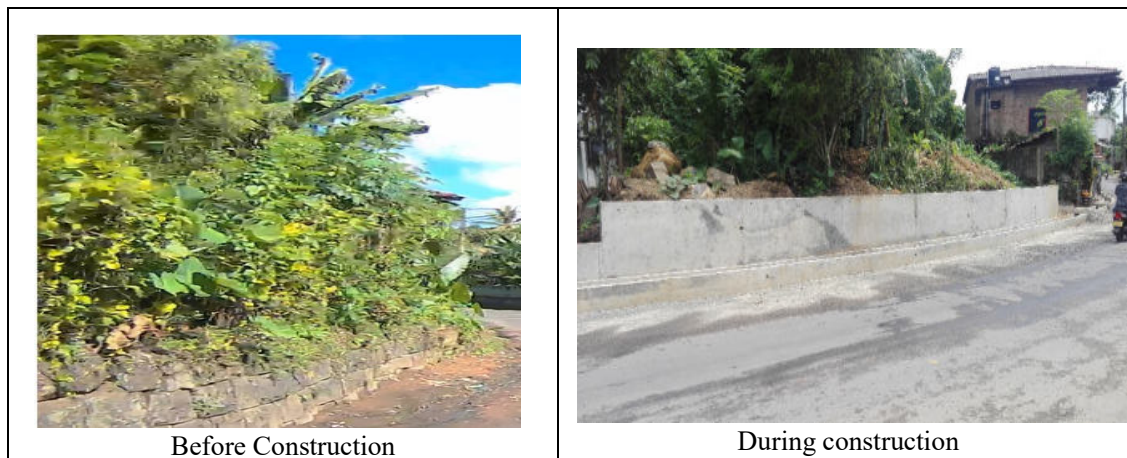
Land Donation and Re construction at Chainge: 2+242-2+259 LHS
